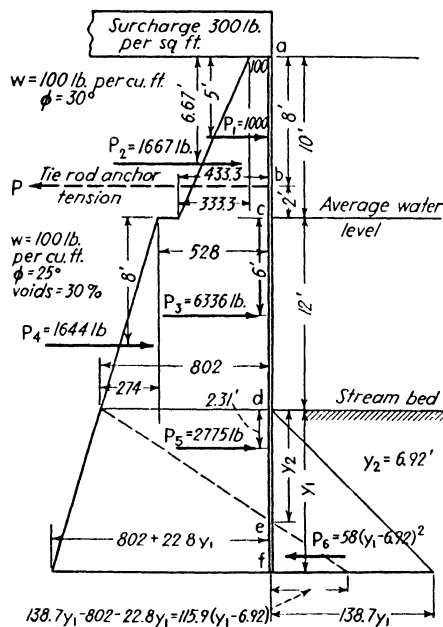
Forces Acting on Anchored Sheet-piling Bulkhead.
